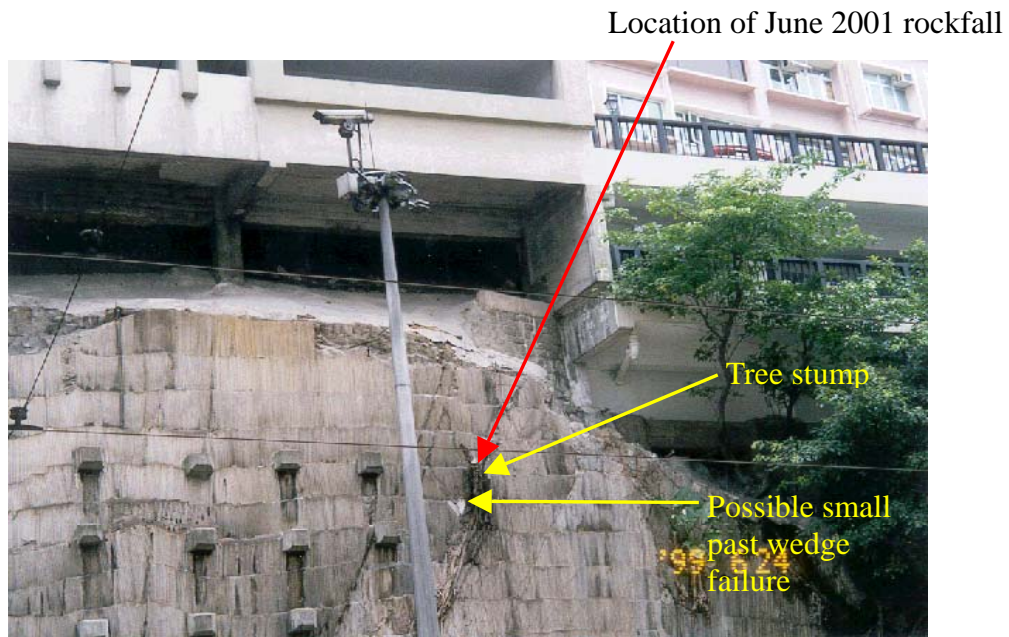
View East towards Slope No. 11SE-A/C561 Showing Tree Stump at Source Location of June 2001 Rockfall Remaining on Slope Face Following Routine Maintenance Works. Note also Possible Small Past Wedge Failure Adjacent to Tree Stump. (Photograph Taken by the GE on 24 June 1999)
